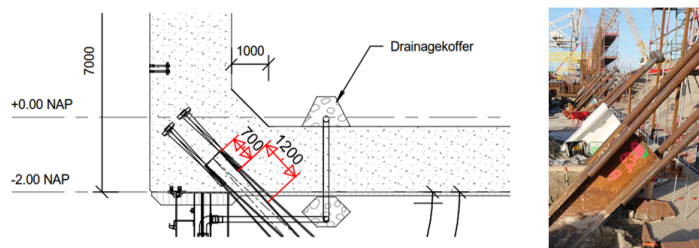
Detail of connection between the relieving platform / concrete bar and the MV-piles, distance is in millimetres
